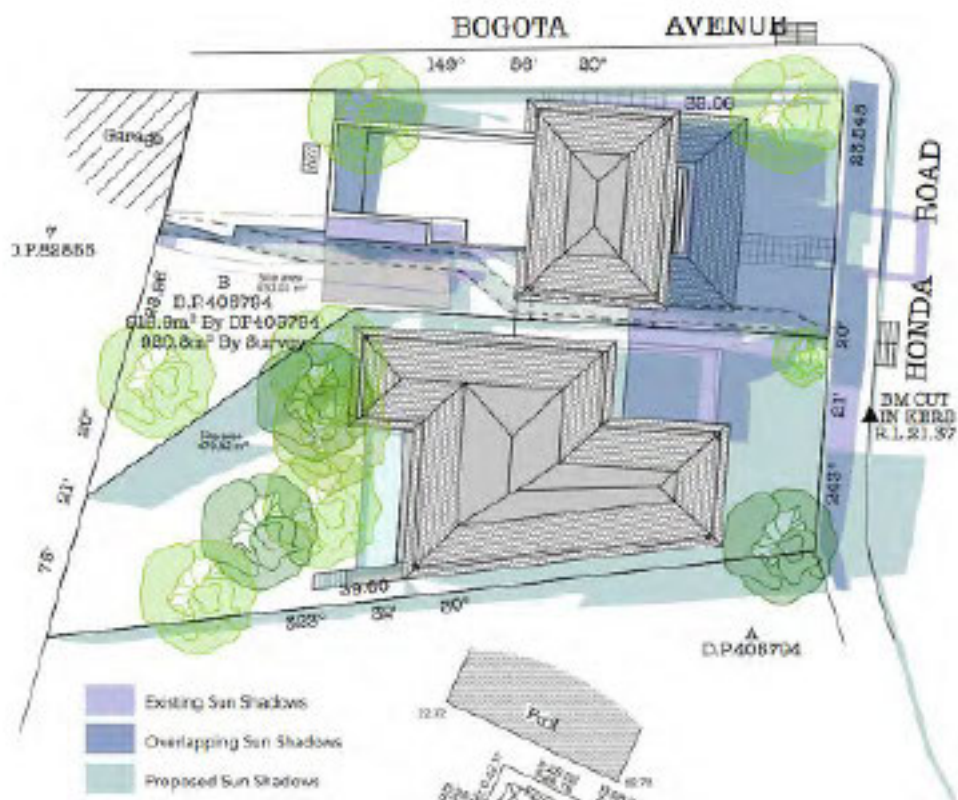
Shadow Diagram at midday in mid-winter (June 21) detailing shadow cast from the Dwelling 1 (subject to alterations and additions) and Dwelling 2 (new dwelling) – DA29 Rev B
